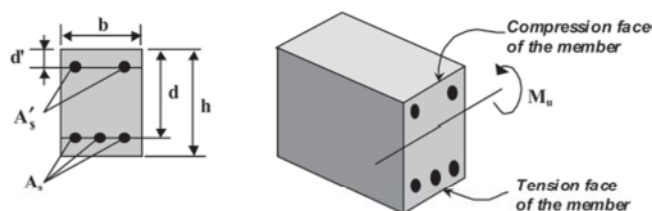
Design dimensions for moment strength: sections with compression reinforcement.
